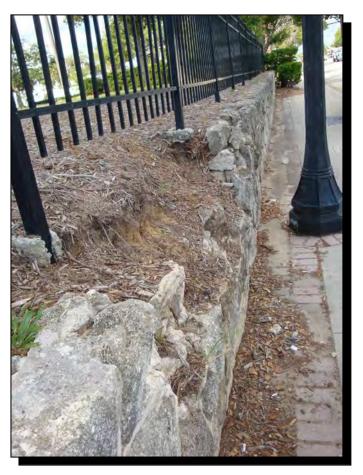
Wall in need of repair at Granada Boulevard and Ridgewood Avenue
